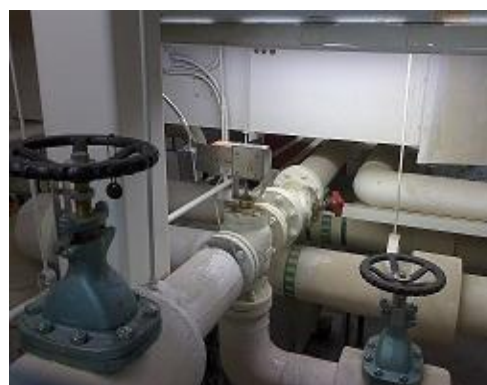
Conventional image of exposed valve bonnets and motorized three way valve.
